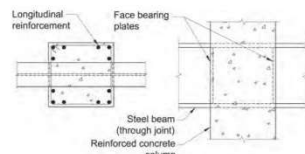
Reinforced concrete column-to-steel beam moment connection.
